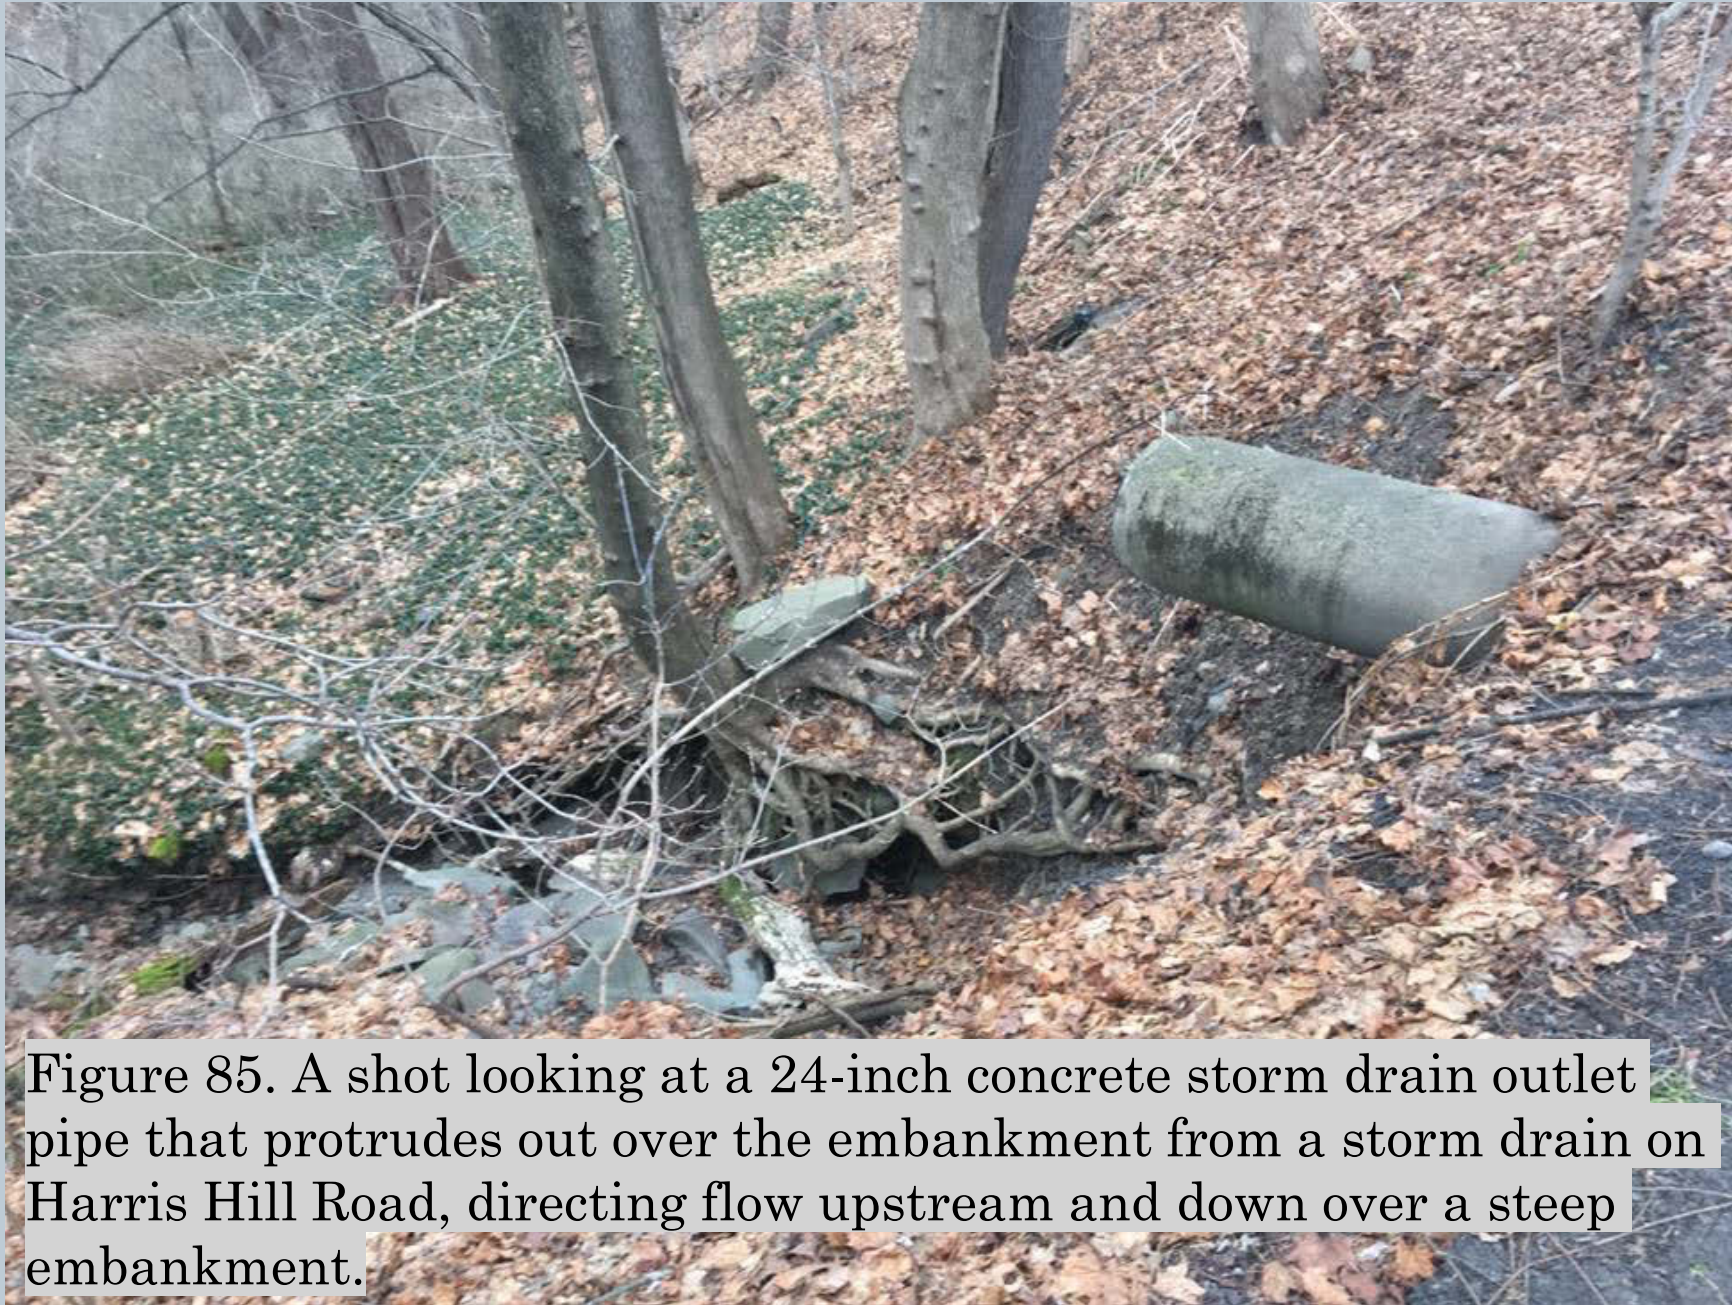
A shot looking at a 24-inch concrete storm drain outlet pipe that protrudes out over the embankment from a storm drain on Harris Hill Road, directing flow upstream and down over a steep embankment.
